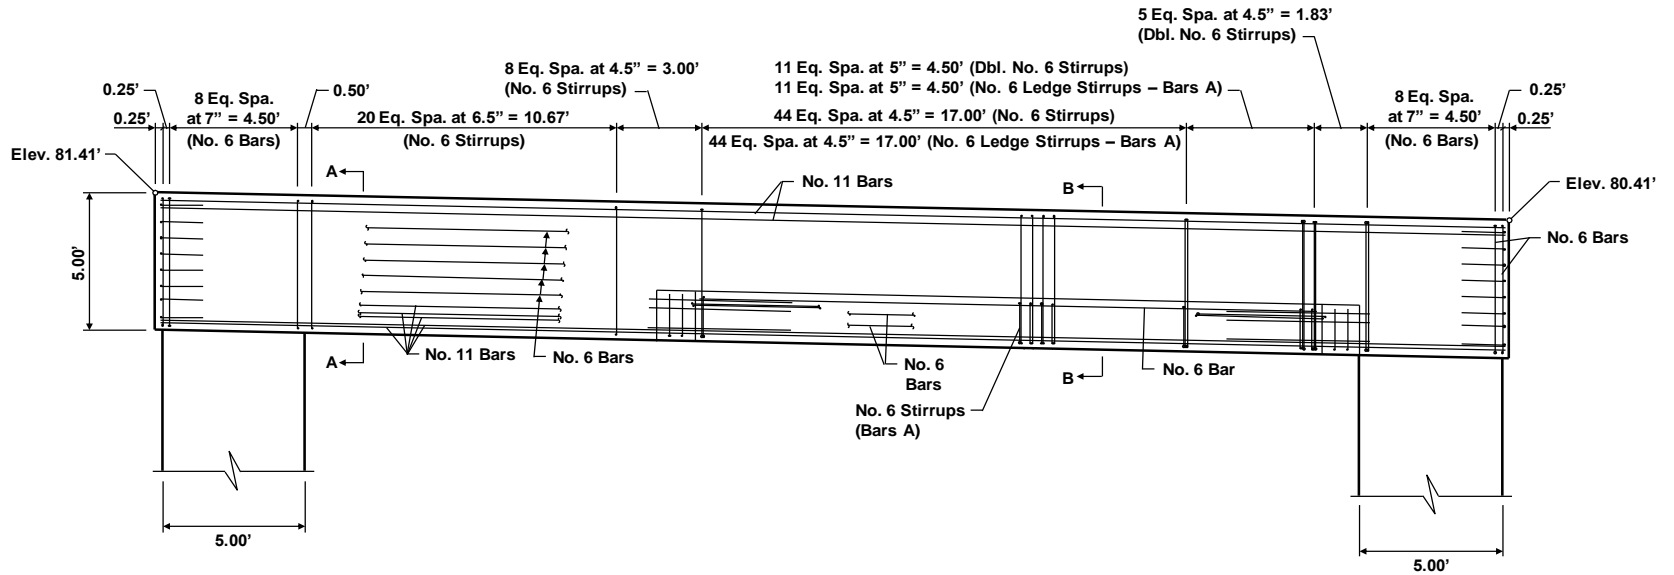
Reinforcement details – elevation (design per proposed STM specifications – simply supported)
